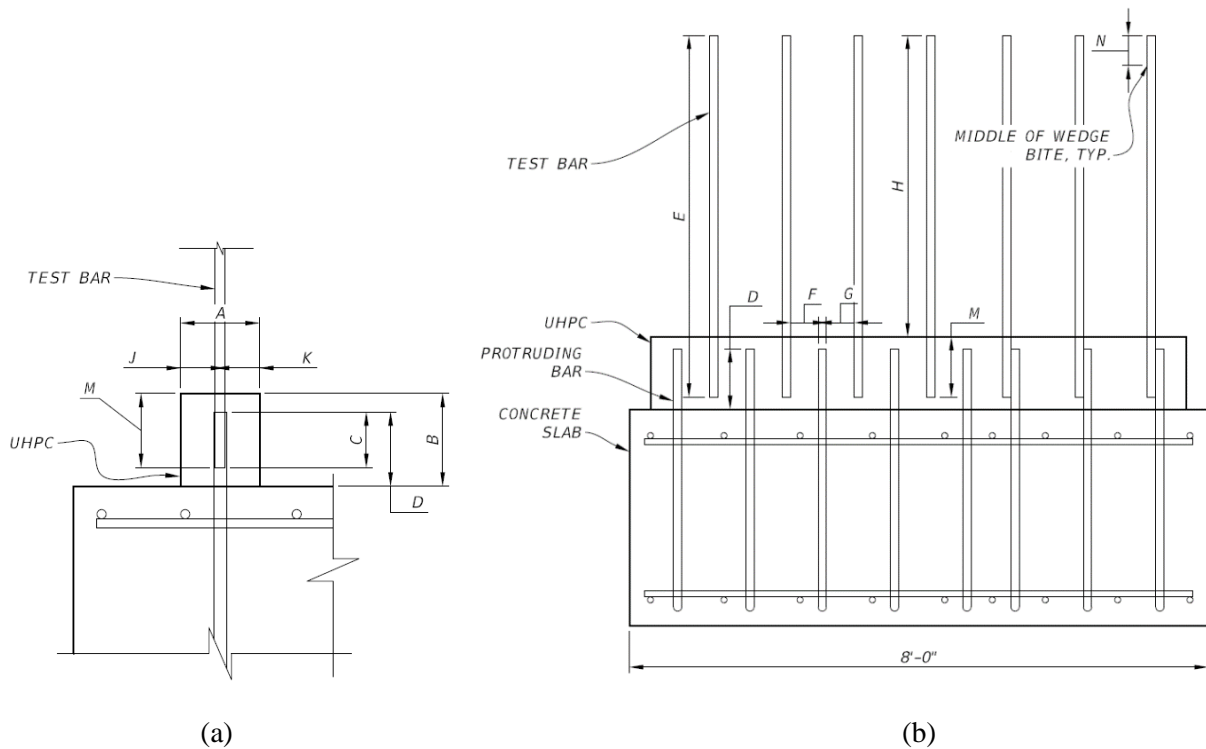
UHPC splice dimensions with (a) section and (b) elevation
